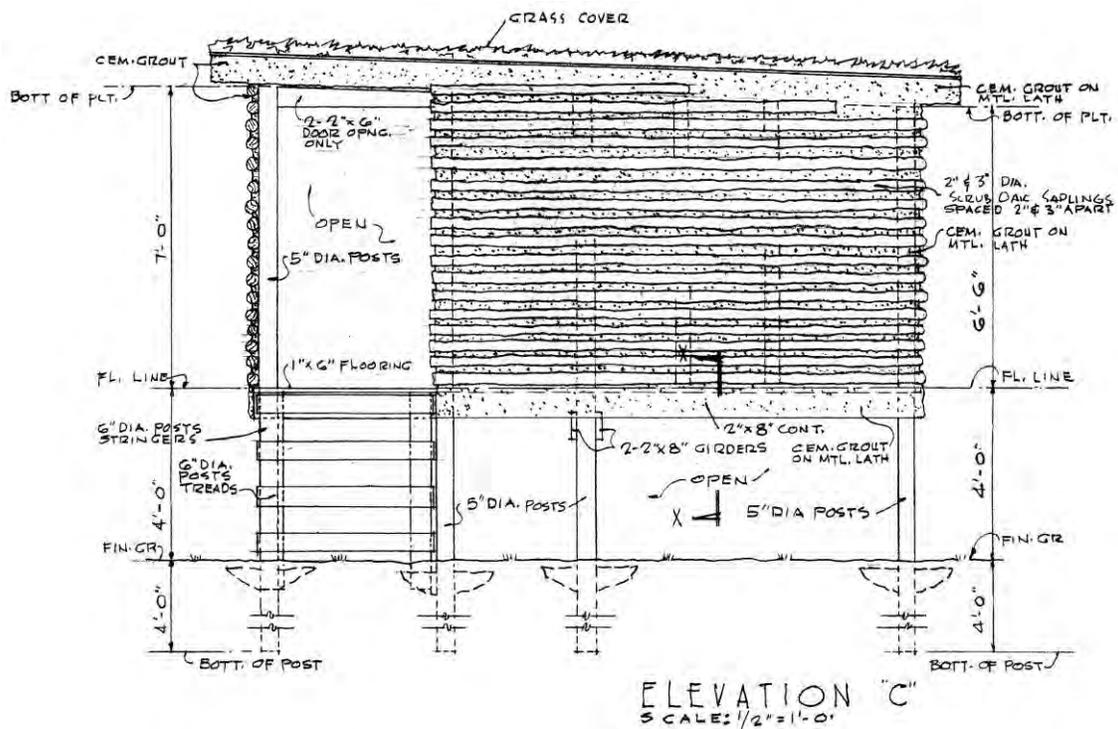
Montagnard house elevation "C", Camp Gordon, 1966 (standard drawing GOR 28-13-09 sheet 16, Vietnamese and Montagnard houses plans, elevations, and sections, 1 April 1966).
